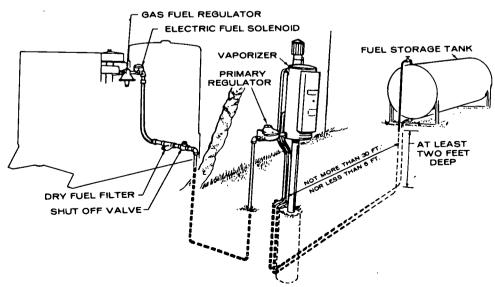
TYPICAL INSTALLATION OF LPG WITHDRAWAL SYSTEM
